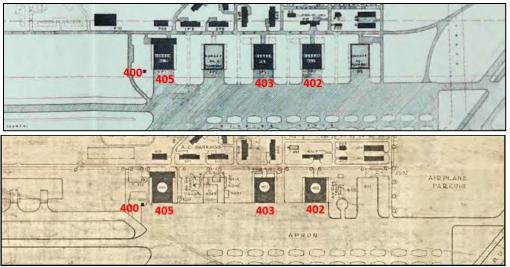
Top, US Engineer Office "Project Plan North of Runway," July 1942; bottom, "Reservation Layout, Ramey Air Force Base" plan, May 1944.
